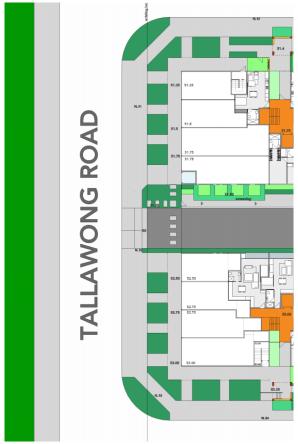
Ground floor plan of the proposed development showing proposed commercial units in white.
